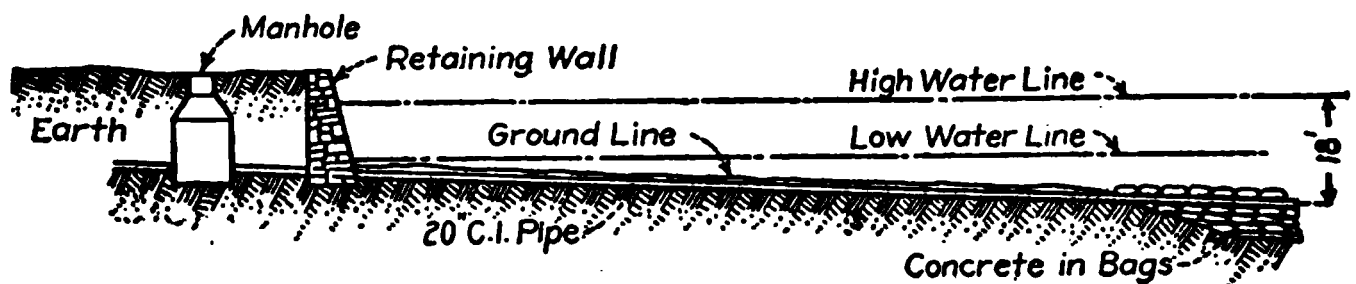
Anchorage of concrete in bags for submerged outfall.
